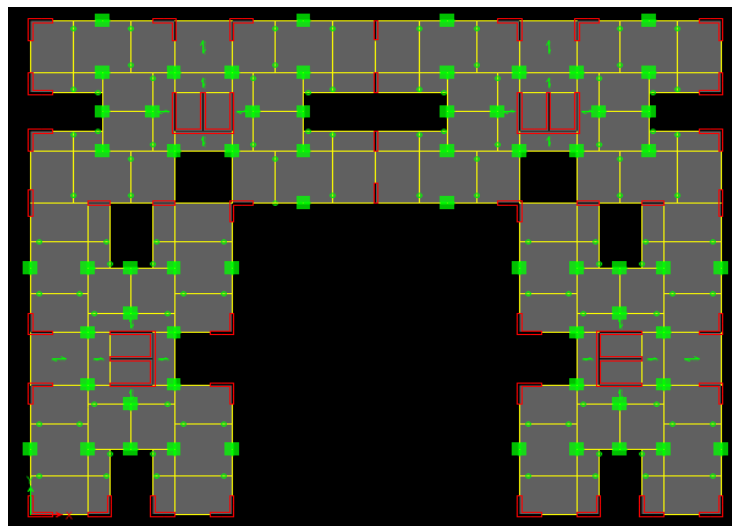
PLAN (MODEL NO 3 - SHEAR WALL STRUCTURE WITH "L" SHAPED SHEAR WALL ARE PLACED AT CORNERS)
